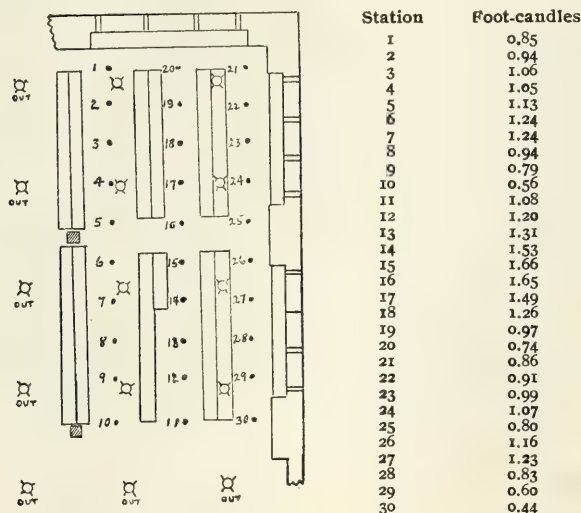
Floor of filing department, showing test stations and illumination readings.
